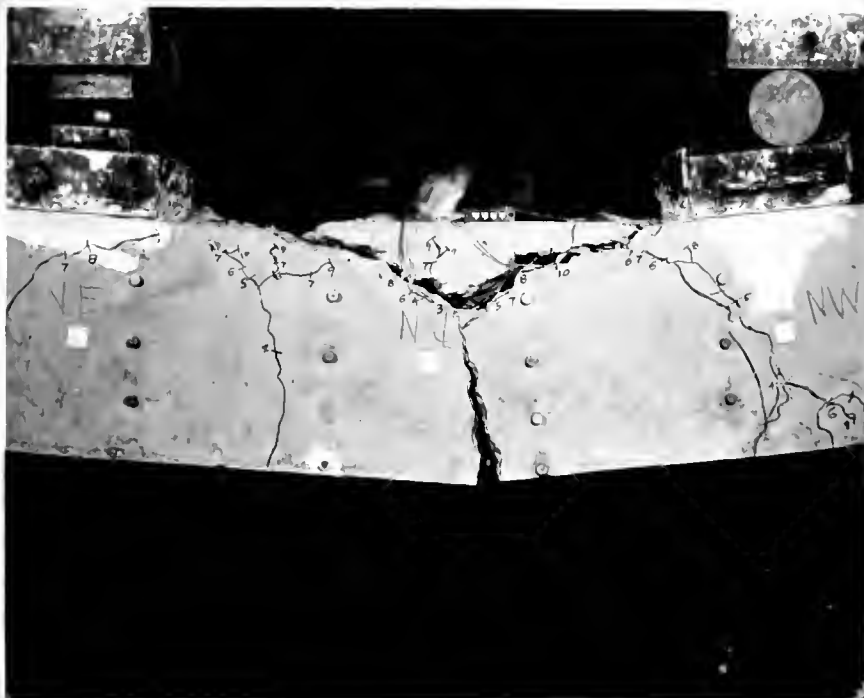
VIEW OF BEAM B2 AFTER FAILURE
